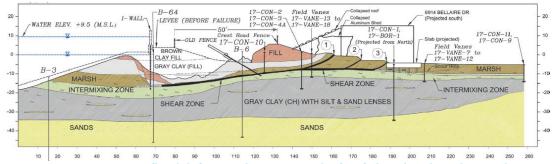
Cross section flood defence 17th Street Canal, after failure (Seed, et al., 2008c)
